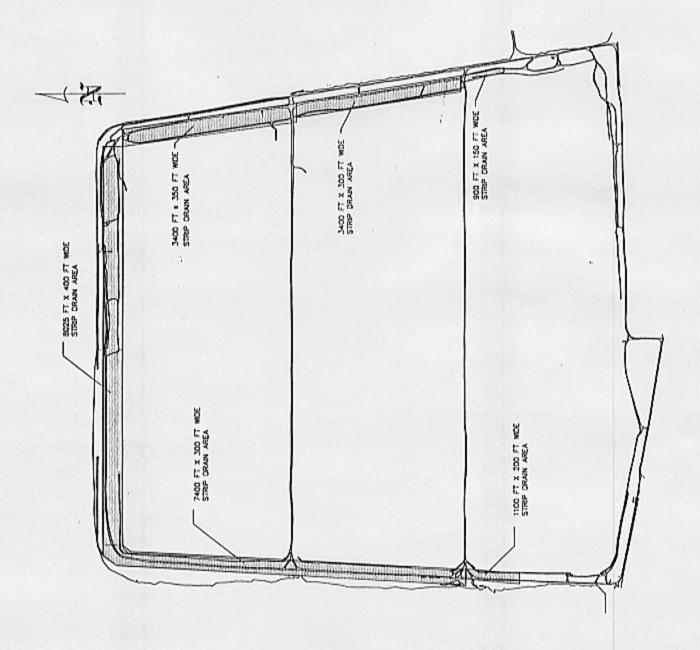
Proposed Areas of Vertical Strip Drain Installation, Craney Island
